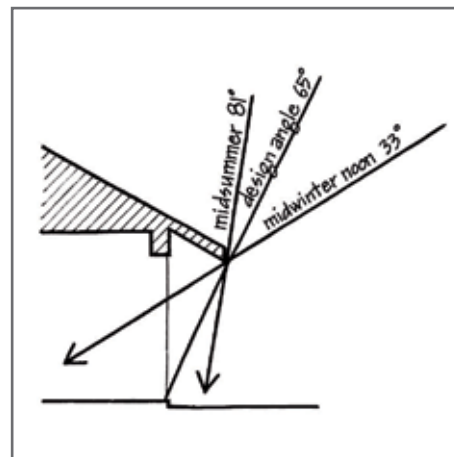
Calculating appropriate eaves overhang on north side of dwelling (Source: WAPC, 2008)
